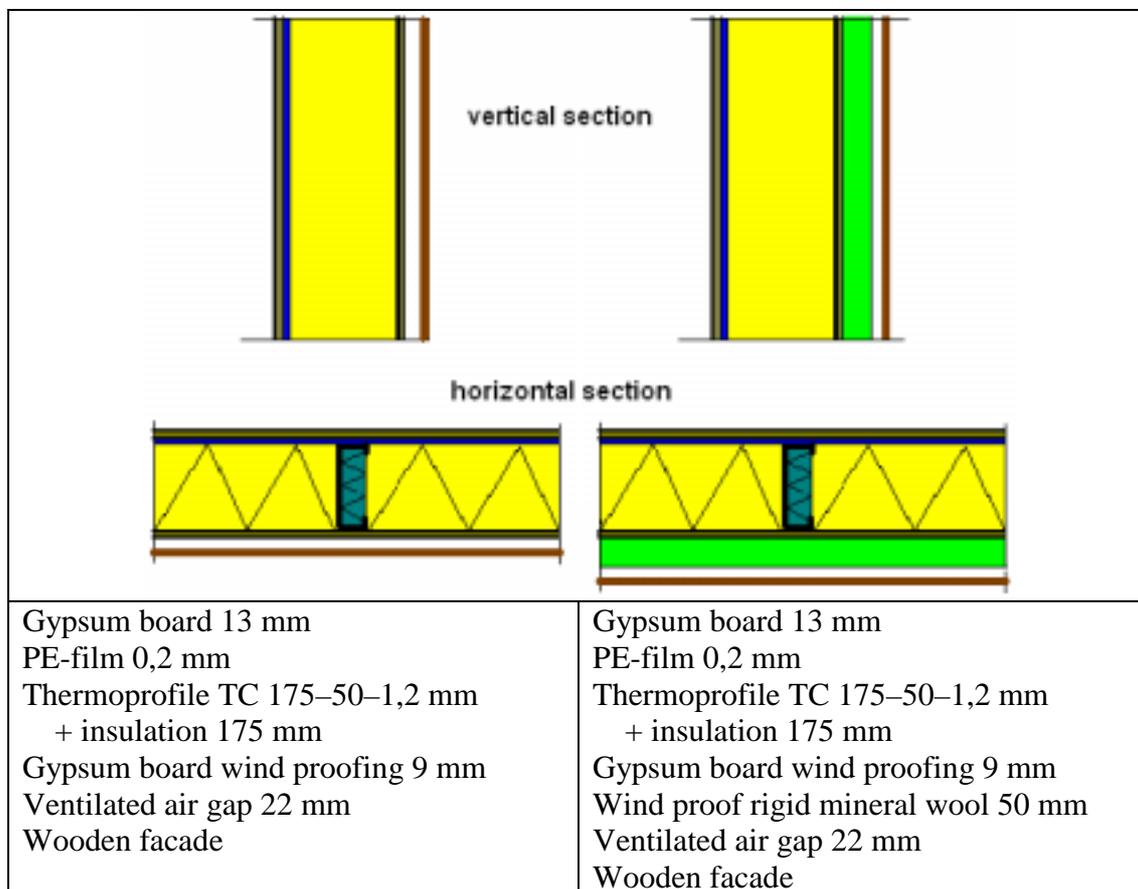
Illustration of the structure with perforated light gauge steel frame without and with exterior insulation.
